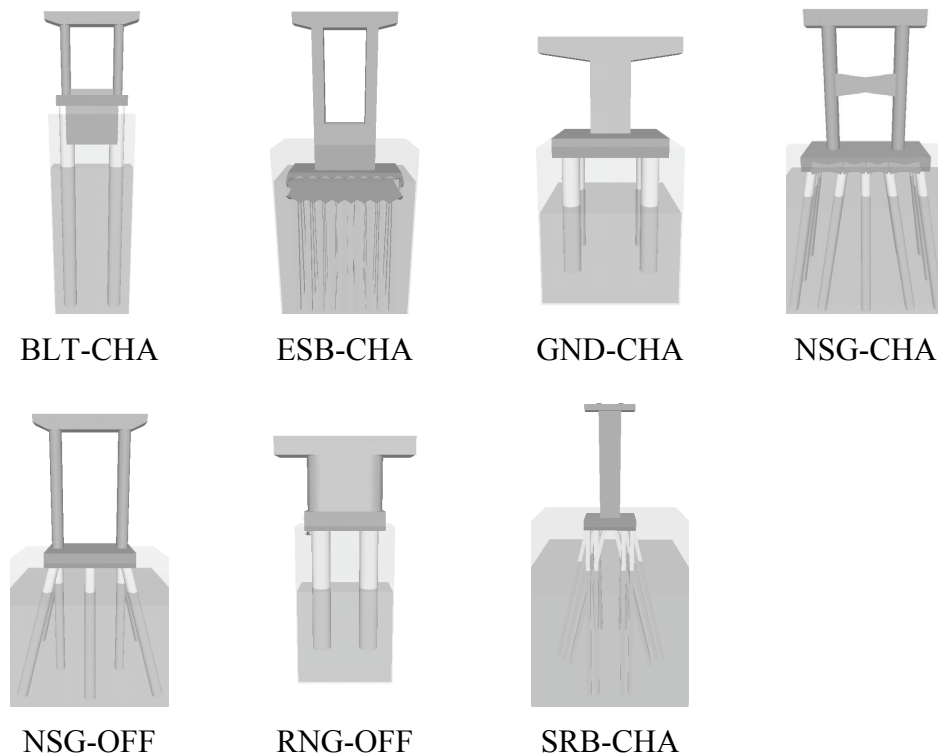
Bridge pier structural configurations representative of existing bridge infrastructure (superstructures not shown; Case IDs are shown in Table 4.1)
